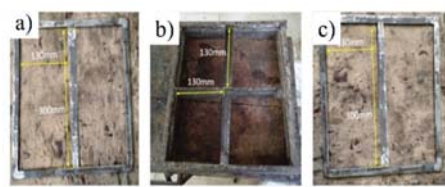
Mold specimen (a) Tensile Test thickness of 25 mm, (b) Hardness Test thickness of 50 mm, (c) Bending Test thickness of 40 mm.
